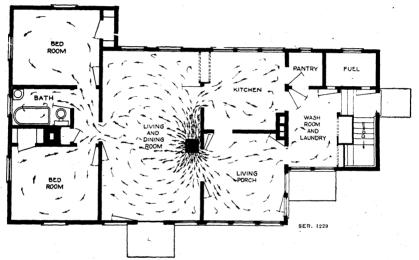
Floor plan showing the circulation of warm and cooled air from a one-register furnace.
